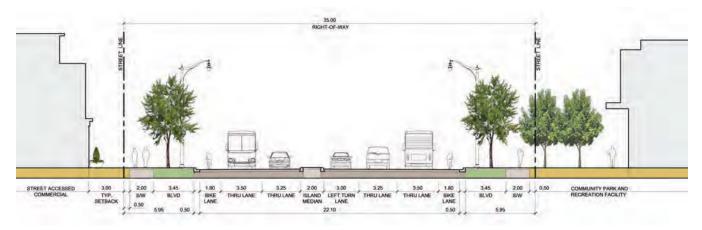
Conceptual treatment along McLaughlin Road between Mayfield Road and Collector Road A (35.0m ROW) with 4 thru lanes, left turn lane, island median, on-street bike lanes and street trees in grass boulevard (looking North).
